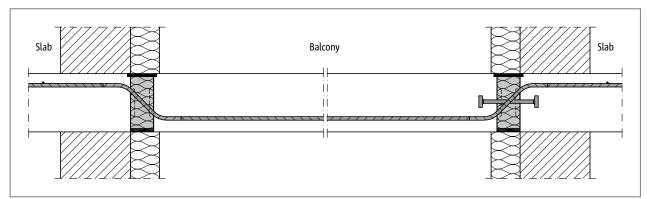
Schöck Isokorb® T type Q-PZ, Q-P: Recessed balcony application see also page 121
